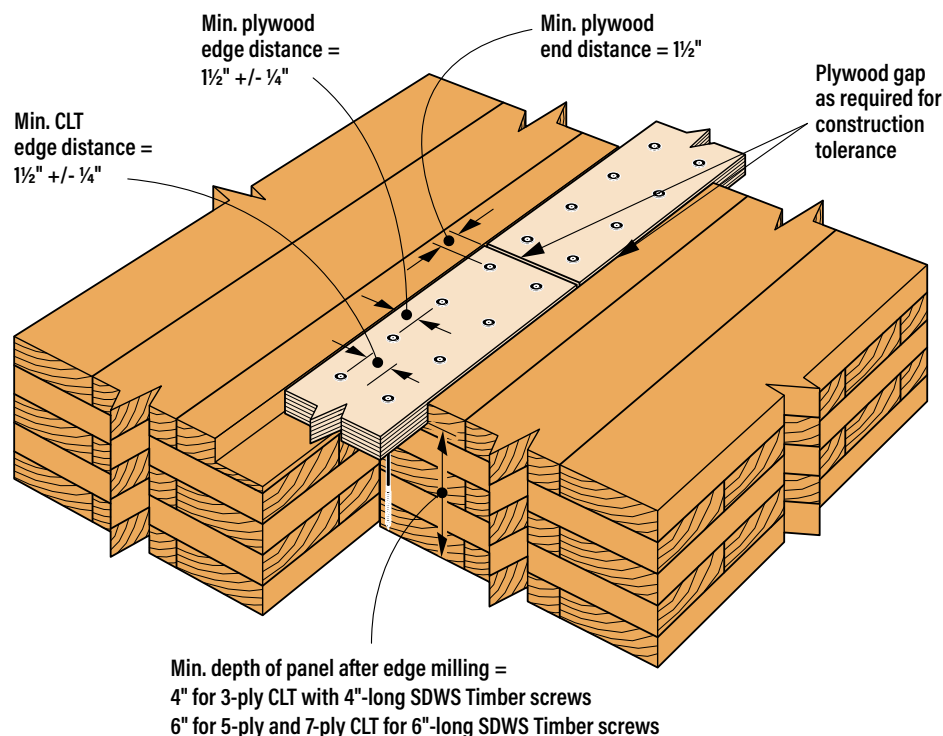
CLT SPLINE CONNECTION DIAGRAM WITH GAP AND FASTENER RECOMMENDATIONS
